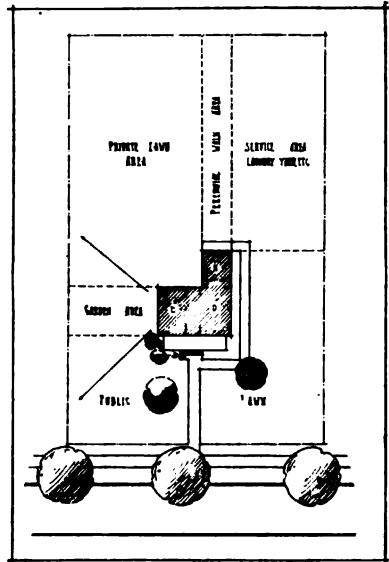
Diagram of a simple landscape development of the ground plan shown in figure 126
